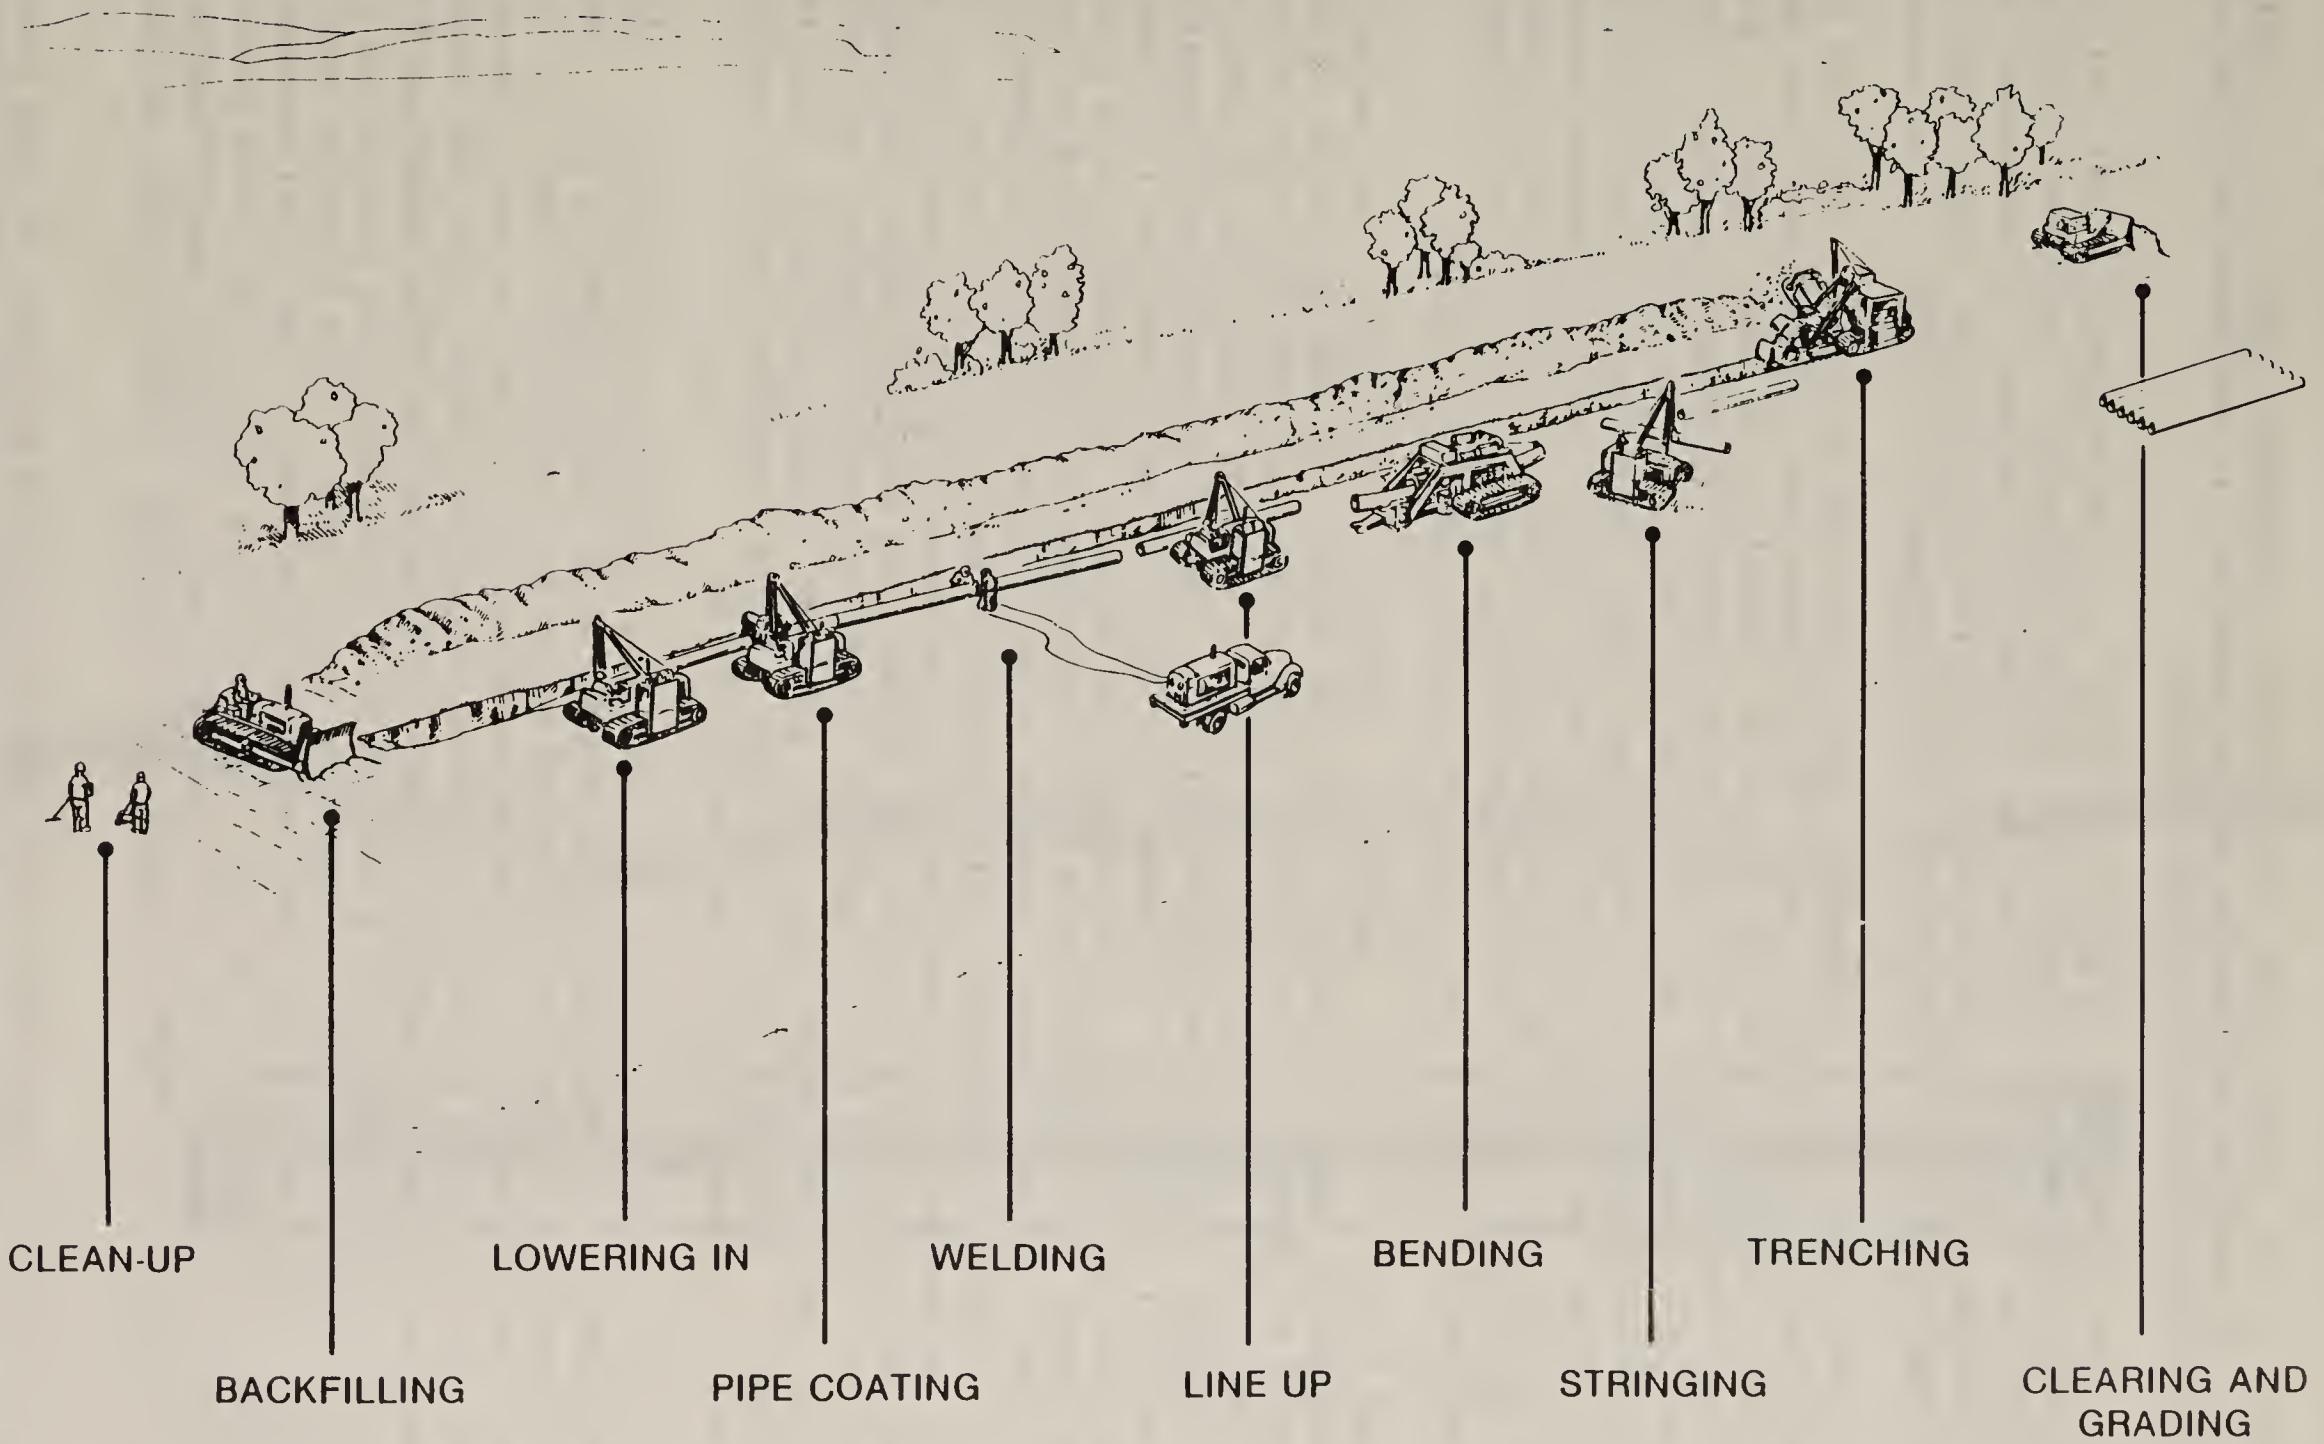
TYPICAL PIPELINE CONSTRUCTION SPREAD
